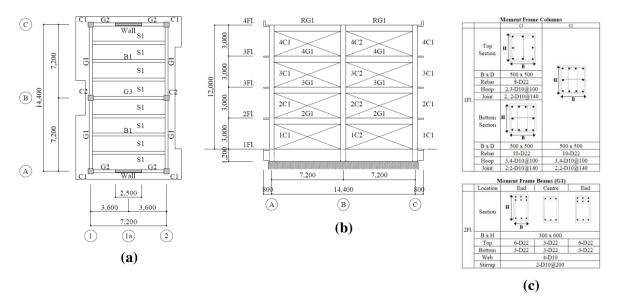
Case study building; (a) plan view, (b) moment frame elevation, and (c) moment frame sections Note: all dimensions are in mm (modified from Nagae et al., 2015)
